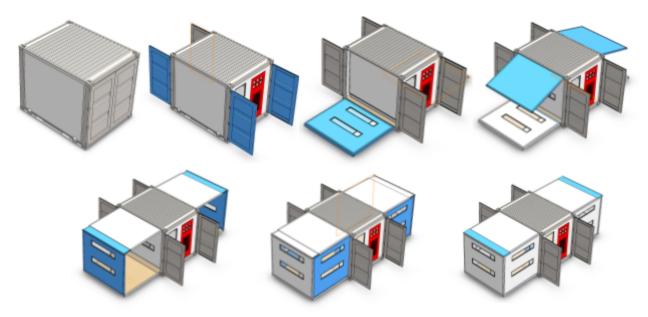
Unfolding shelter steps. This figure shows, in order, the steps necessary to properly unfold the shelter from the container foundation. Open container doors, lower cantilever floors by hand crank, ajar ceiling panel and insert floor gap panels, unfold far-wall panels while simultaneously connecting to ceiling panel, pull-out four side wall panel, and lastly install ceiling clip-ons. Additionally ensure that all panels are properly connected integrated frame locks.
